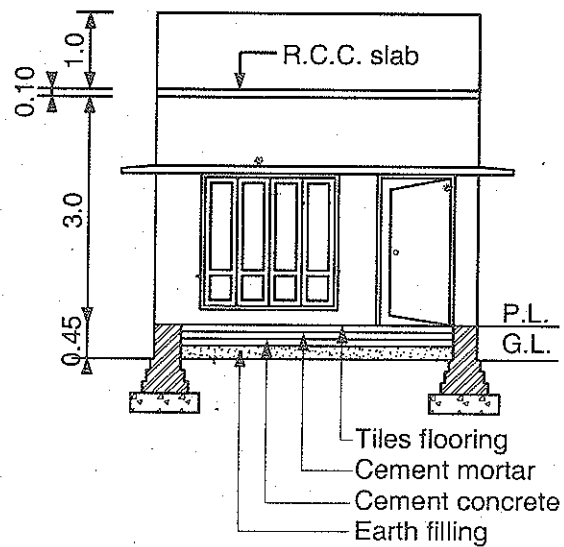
Planing of a Room with Verandah (GTU June 2009)
